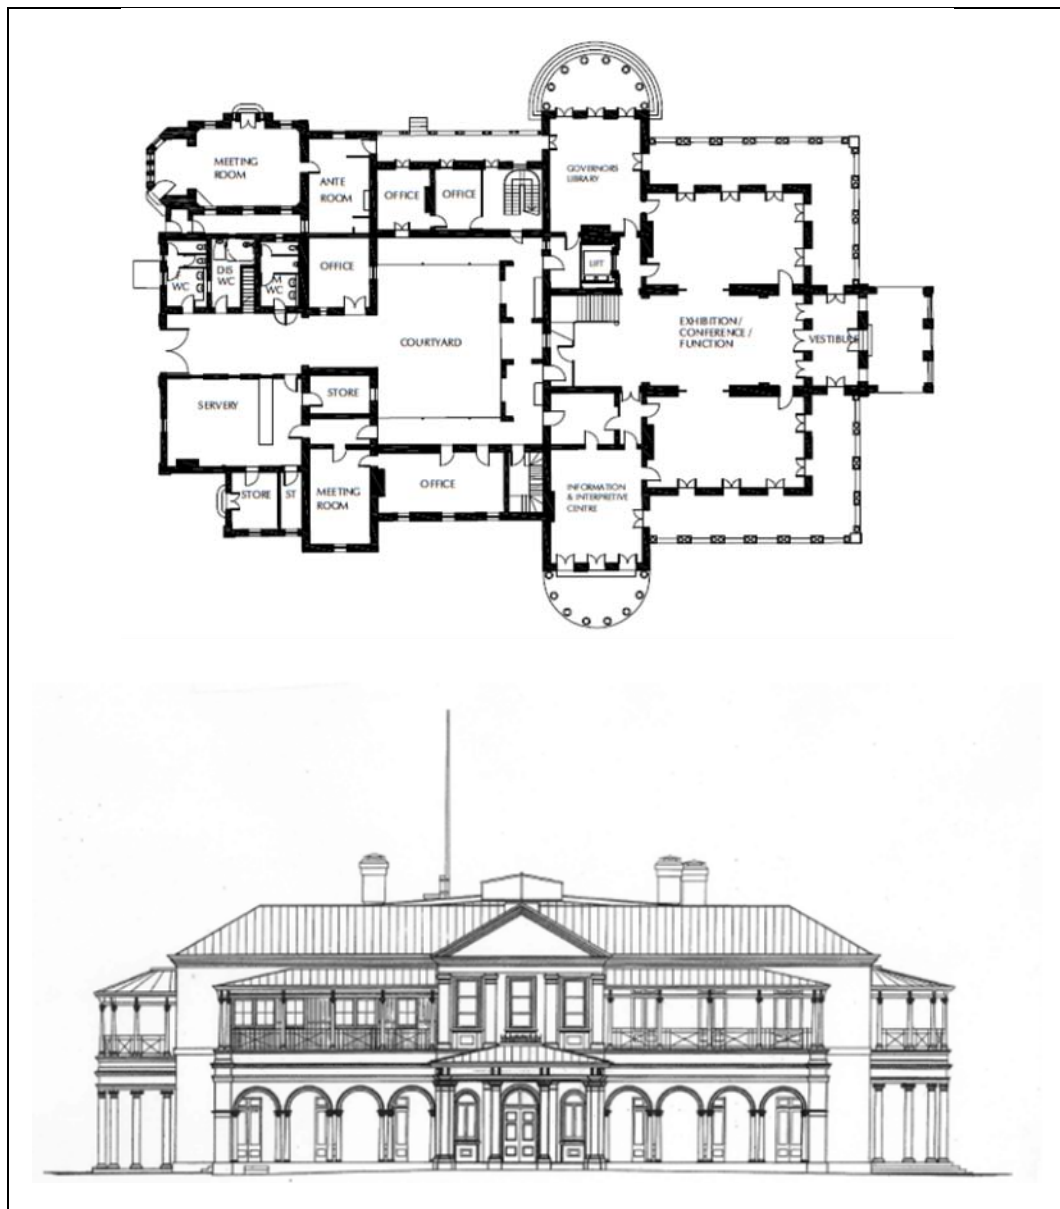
Design symmetry in the ground floor plan and main entrance of the building (Source: QUT Archives)
